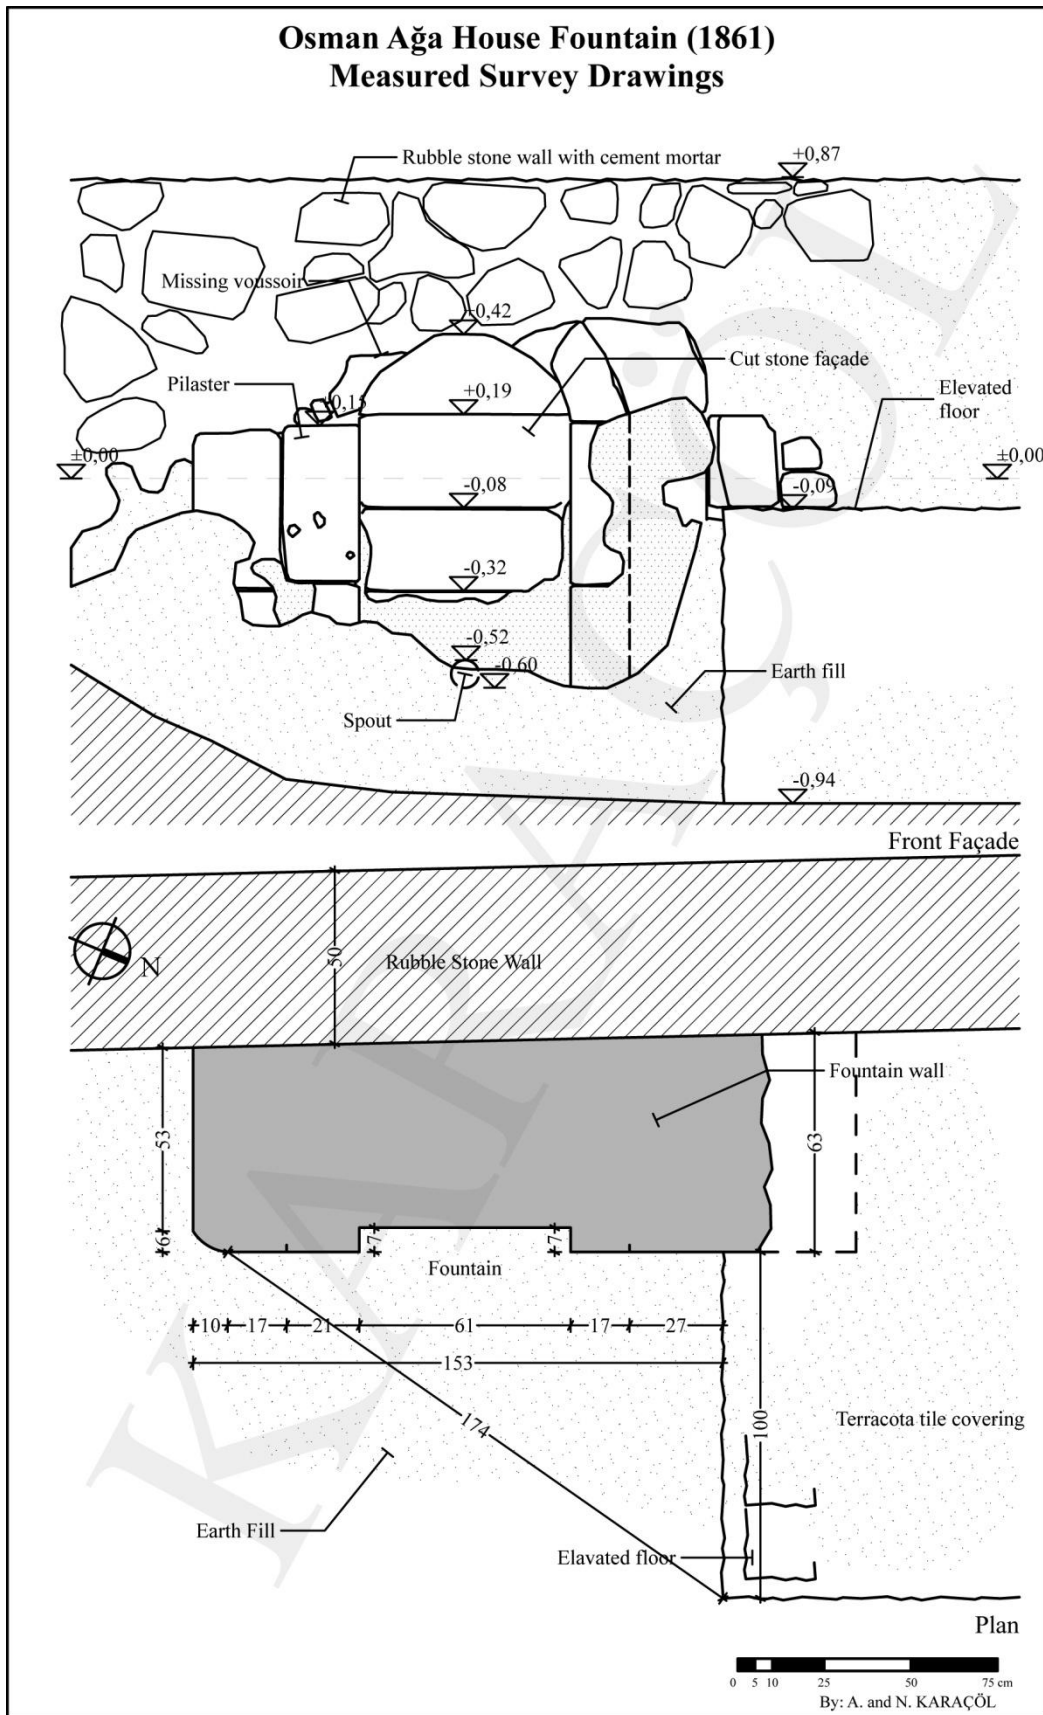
Osman Ağa House Fountain front façade and plan drawings
